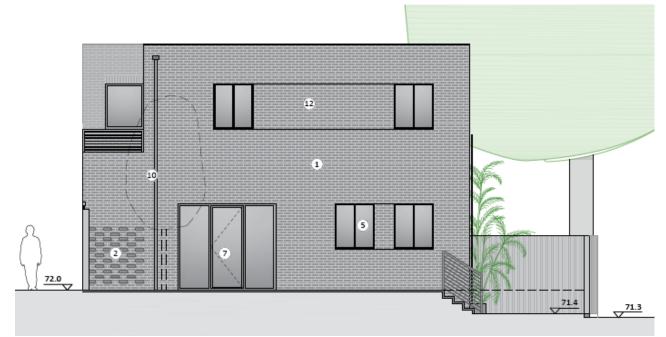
Refused side elevation of planning application 16/00018/FUL.
